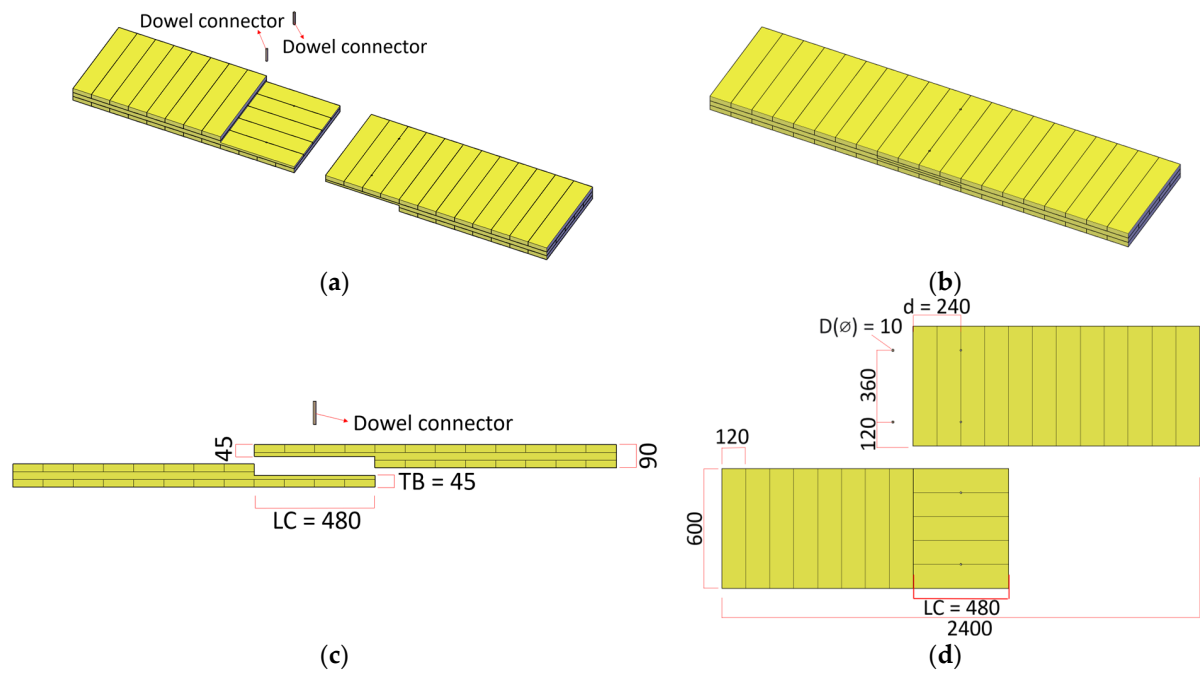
Connected CLT panels using HL edge connection: (a) unjointed version, (b) jointed version, (c) front view, and (d) top view (dimensions are in mm).
